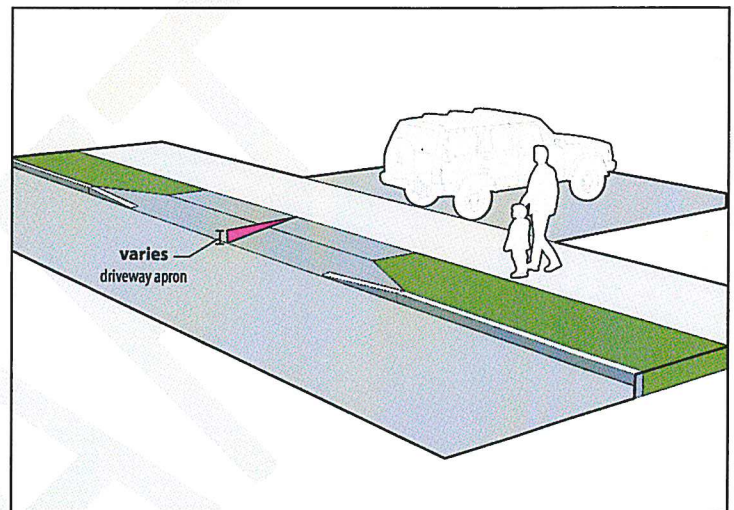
Continuous, level sidewalks across driveways encourage slower speeds and make it easier to create accessible pedestrian routes.
